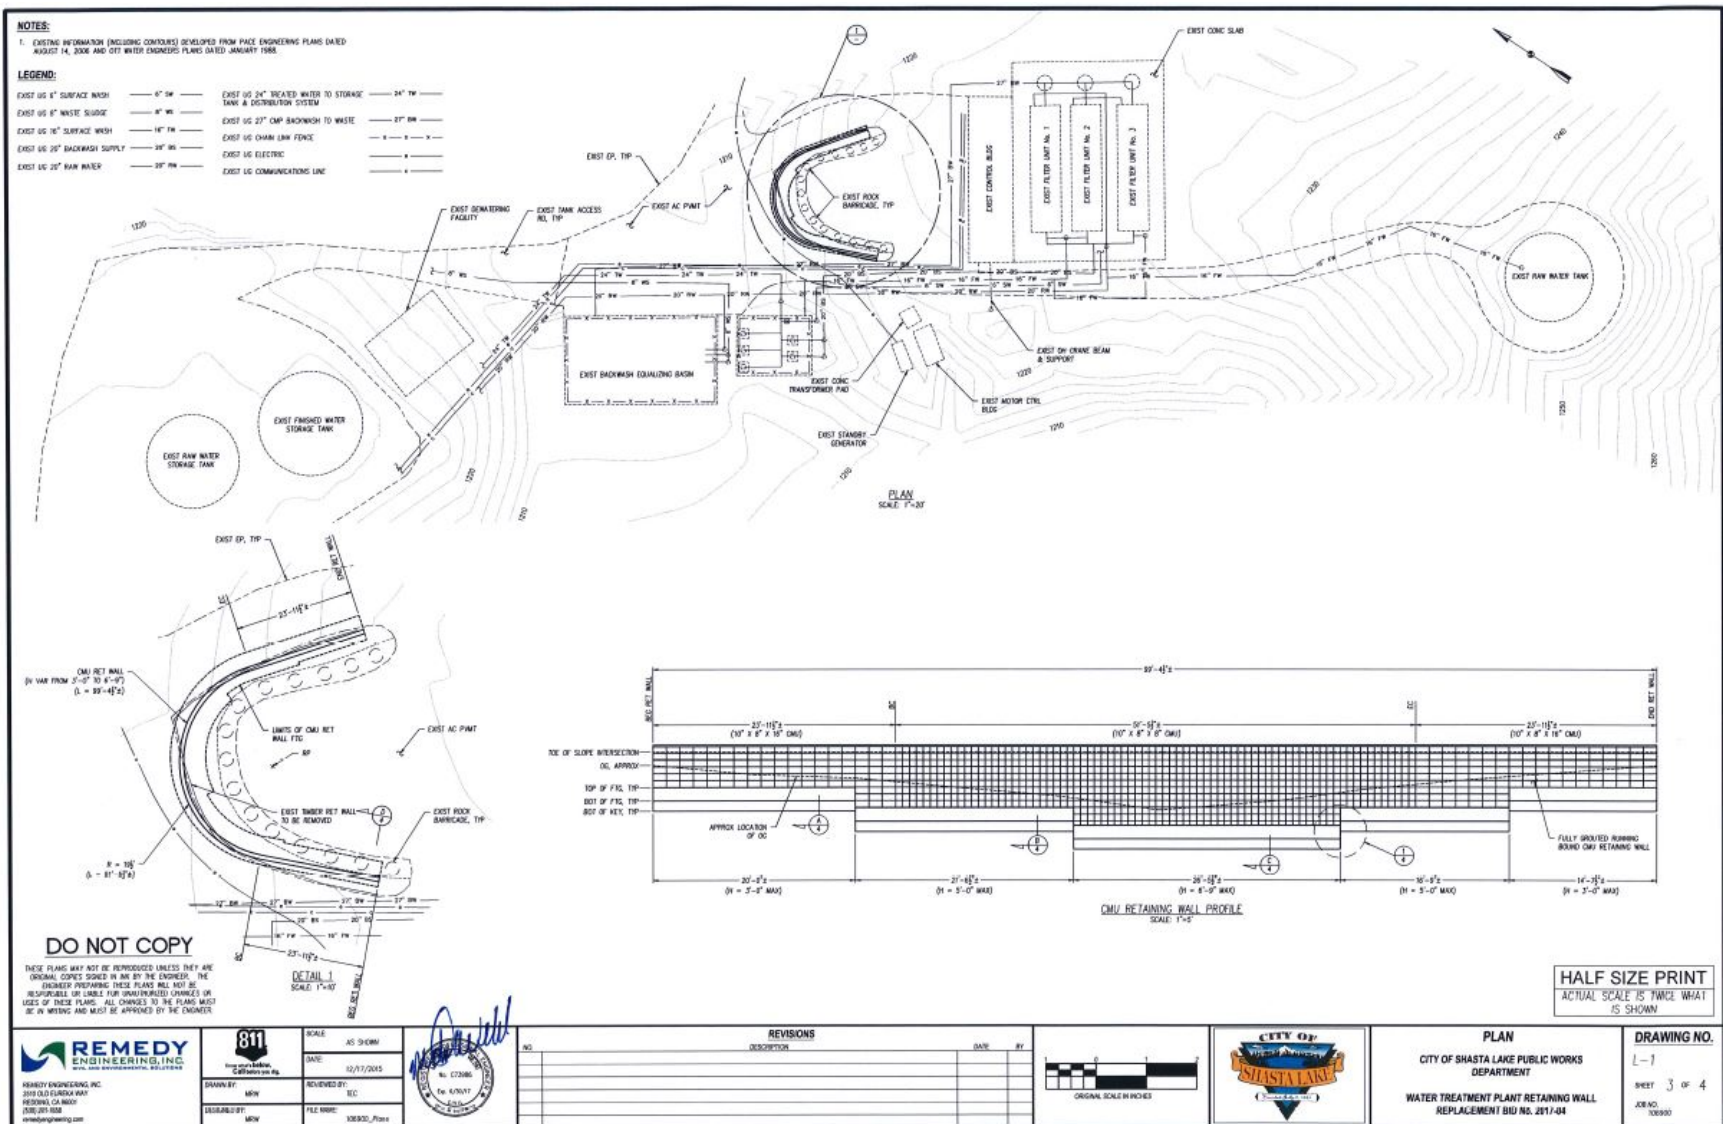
A. Plan view depicting proposed facilities and elevations, courtesy City of Shasta Lake Public Works.
